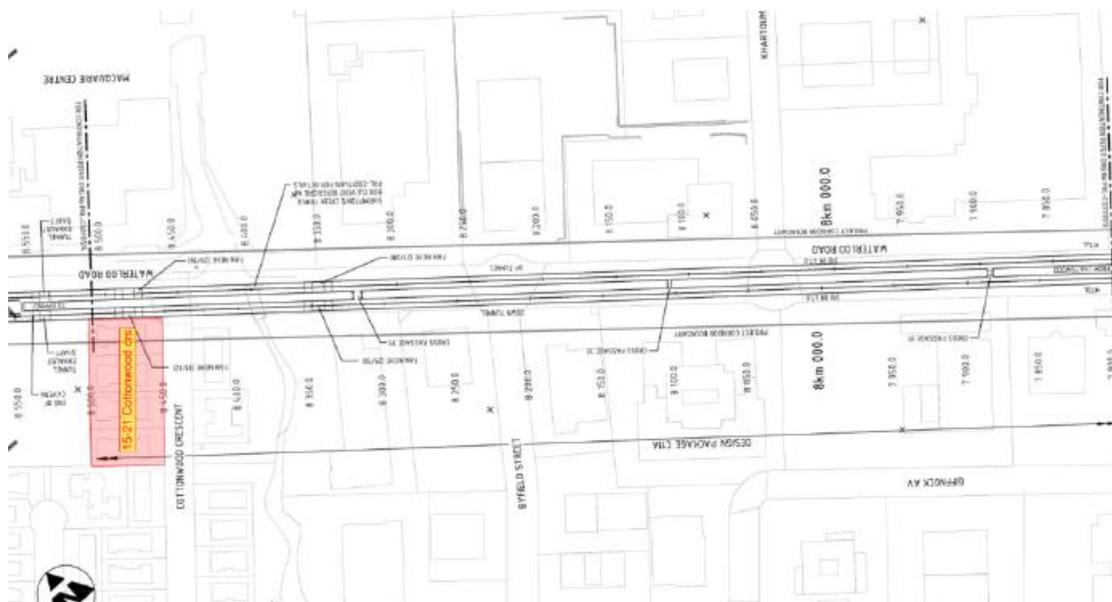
Proximity of the Sydney Metro tunnel network along Waterloo Road (site shaded in pink).
